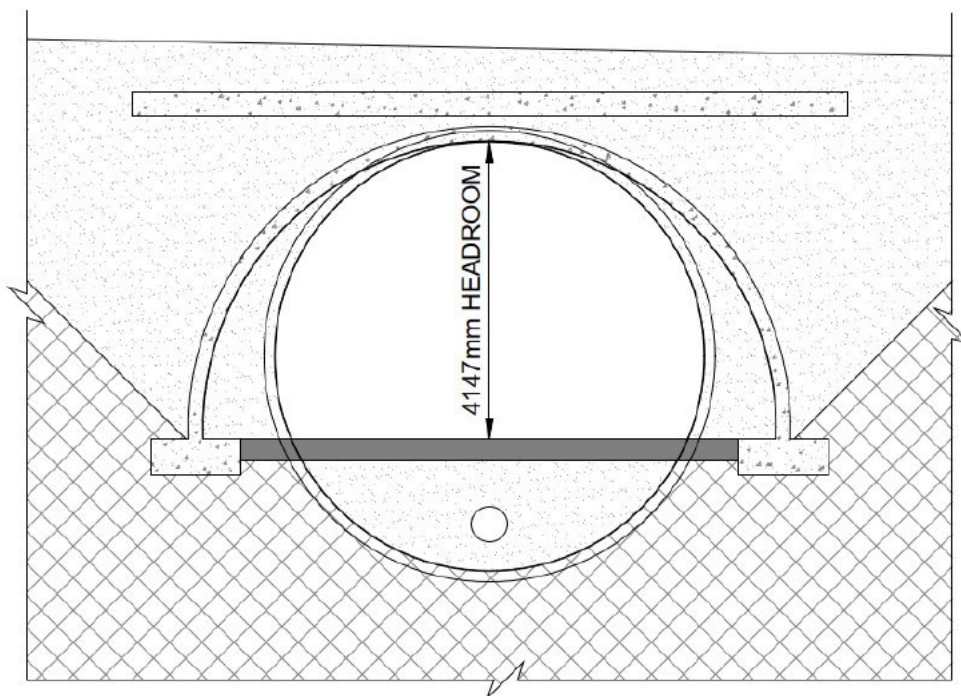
Section view of the concrete arch option where it joins the existing pipe
